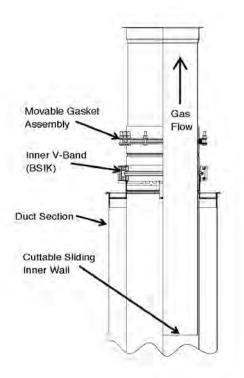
Installation of Adjustable Length Steps 1 & 2
